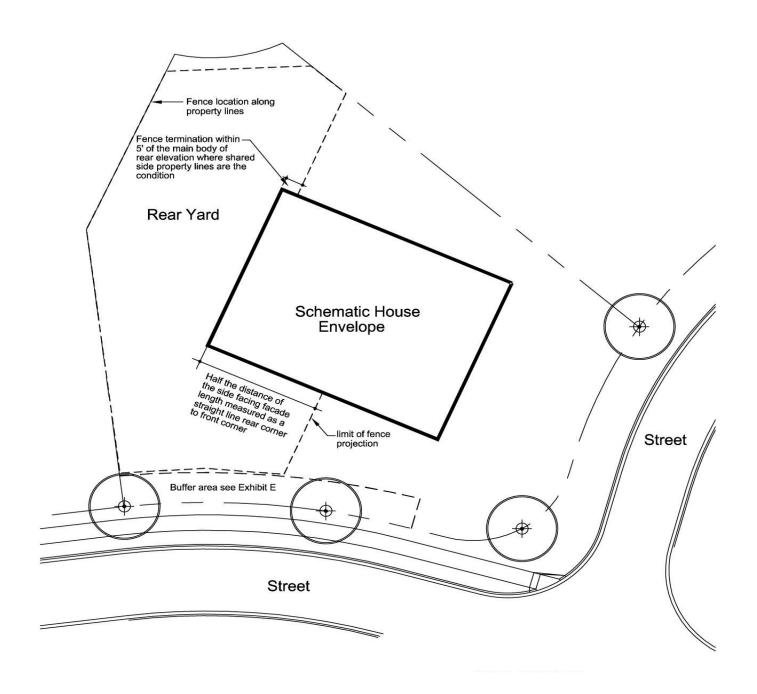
EXHIBIT F – SIDE YARD BUFFER CONFIGURATION – CORNER LOT CONDITION
